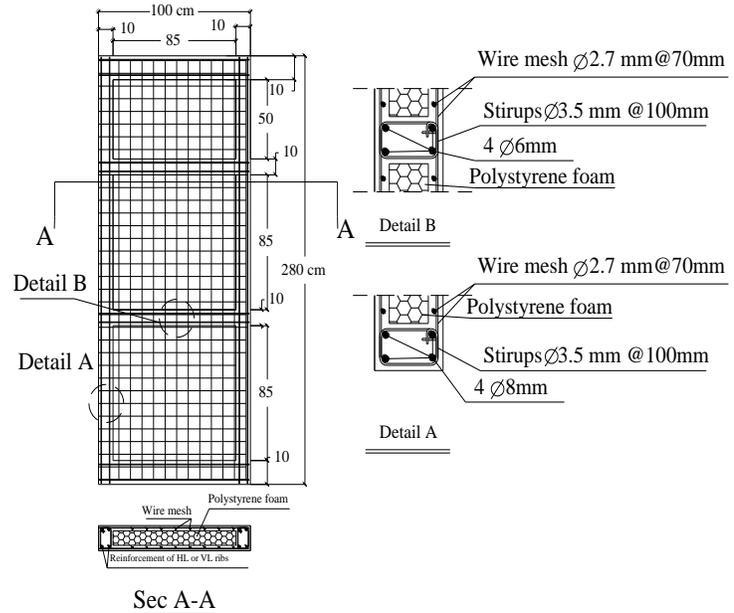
Dimensions and steel detailing of suggested hollow block bearing wall specimen SW2.
